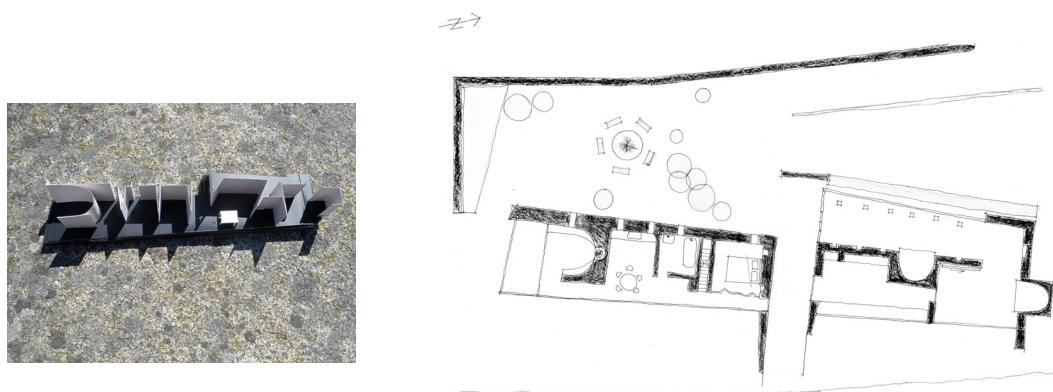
Sketch model; Fig. 7.50 Plan of dwelling and workshop showing places to inhabit and directed views out to the landscape
